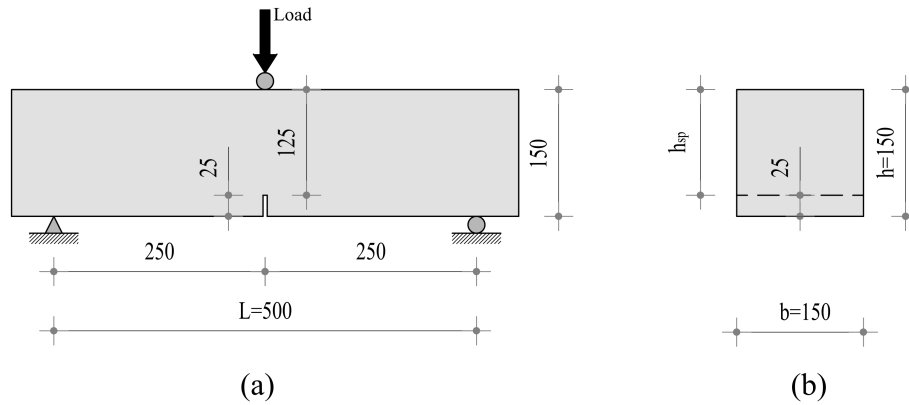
Specimen geometry for EN 14651 [7] test methodology: (a) Front view of the beam specimen; (b) Cross section of beam specimen (dimensions in mm).
